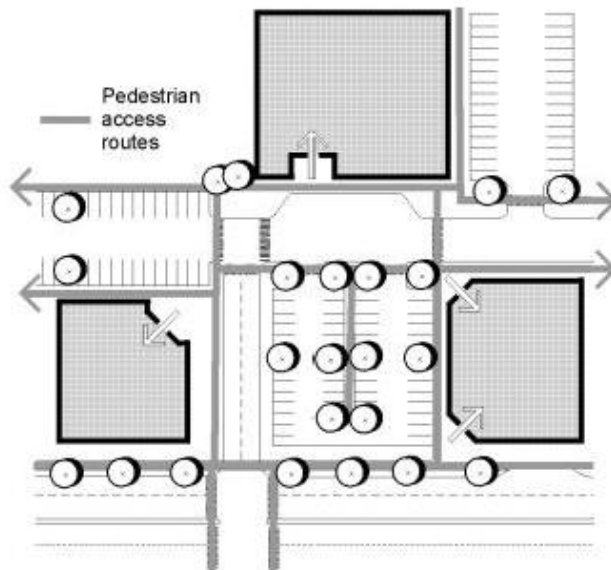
(C). ~~Good~~ Internal pedestrian circulation. Note connections from the street, between buildings and through parking lots.
